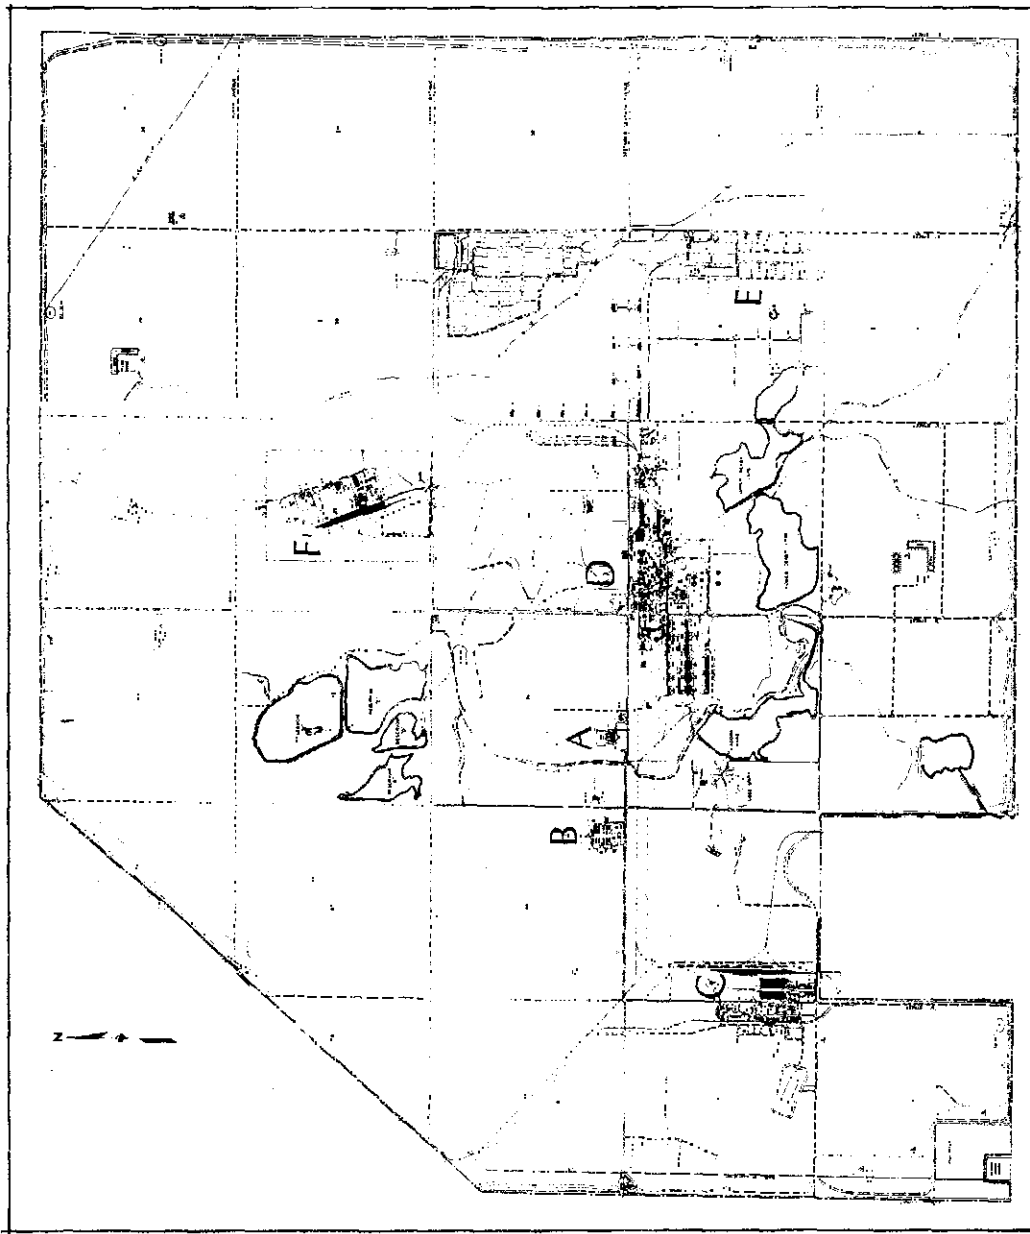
Installation site plan (Source: Facilities Engineer's Office Archives, RMA).
